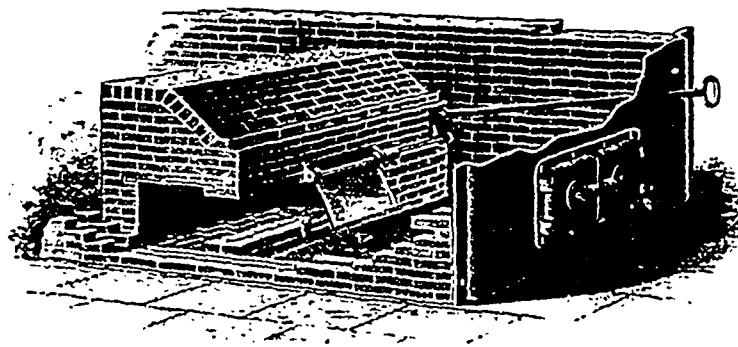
ASHPIT DAMPER IN BRIDGE WALL.
